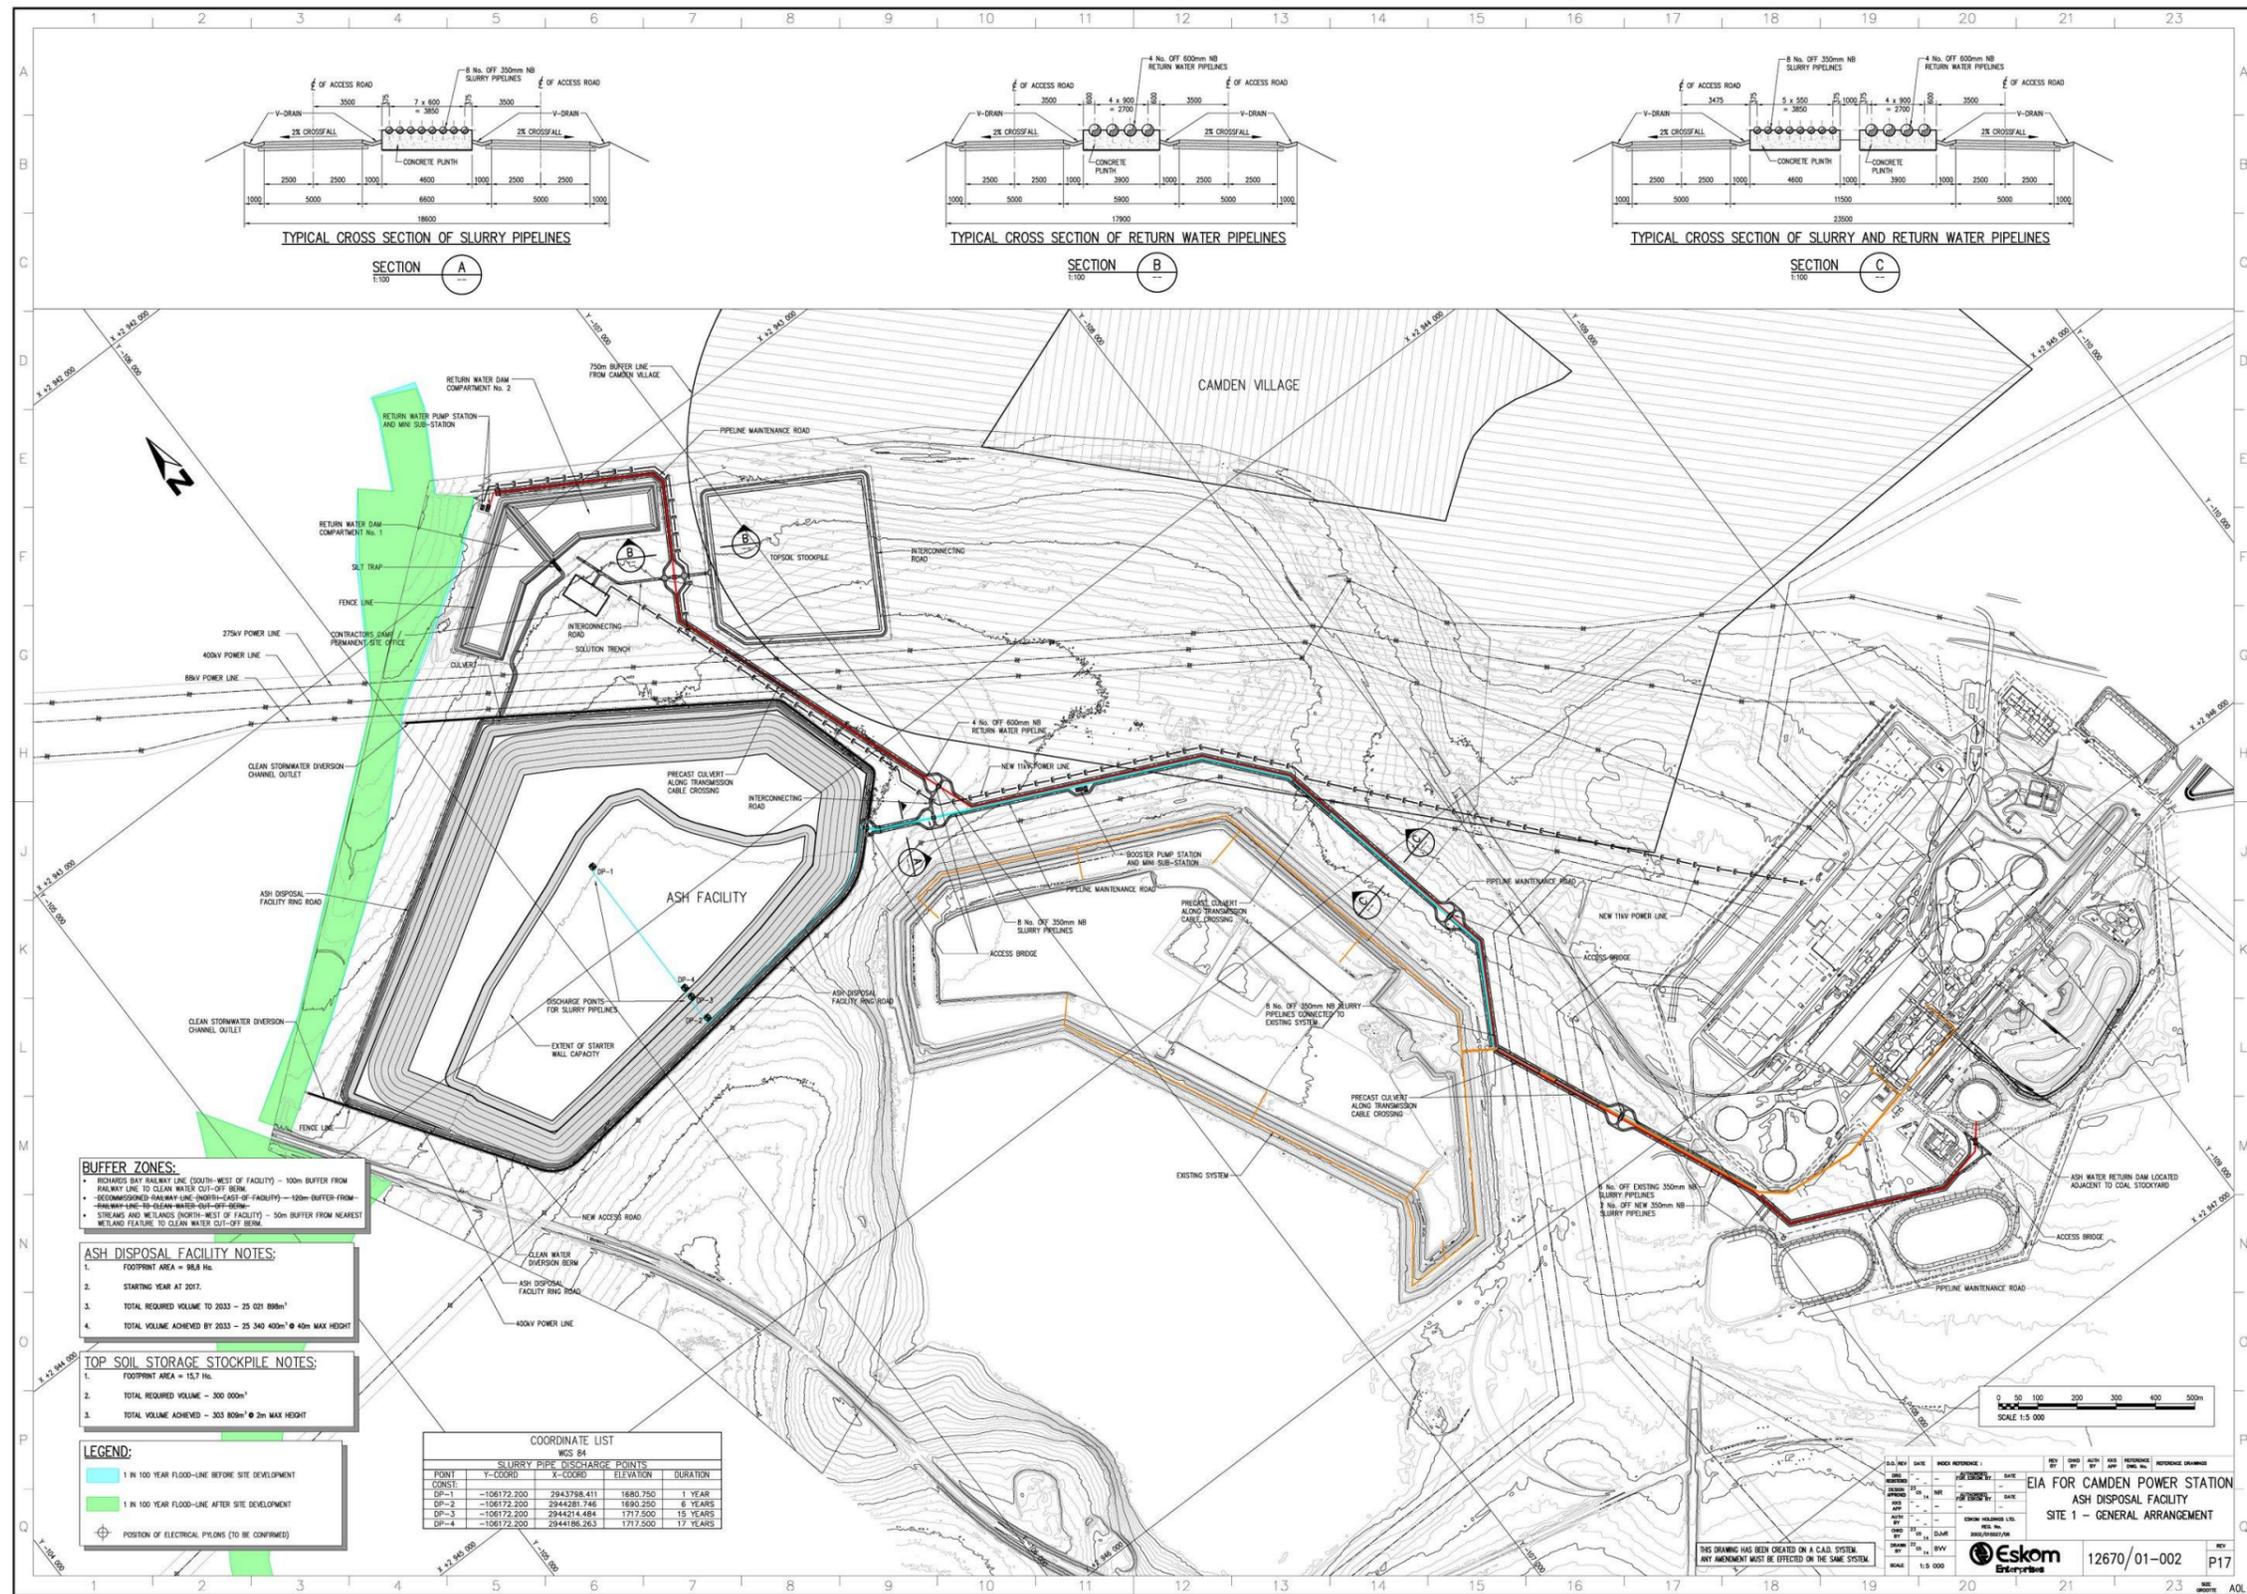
Camden Ash Disposal Facility Expansion Project Layout Map for Site 1
